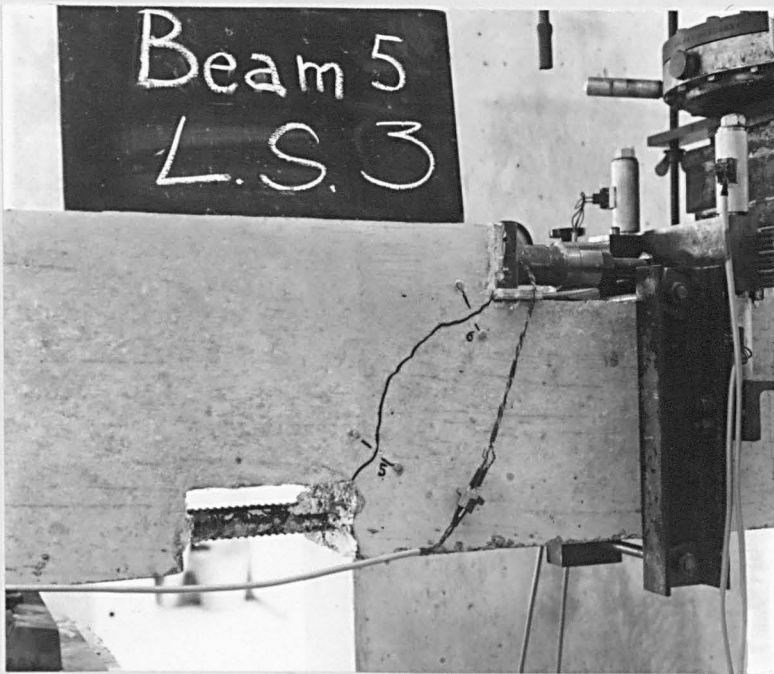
Prefomed crack on beam D5 at start of test
